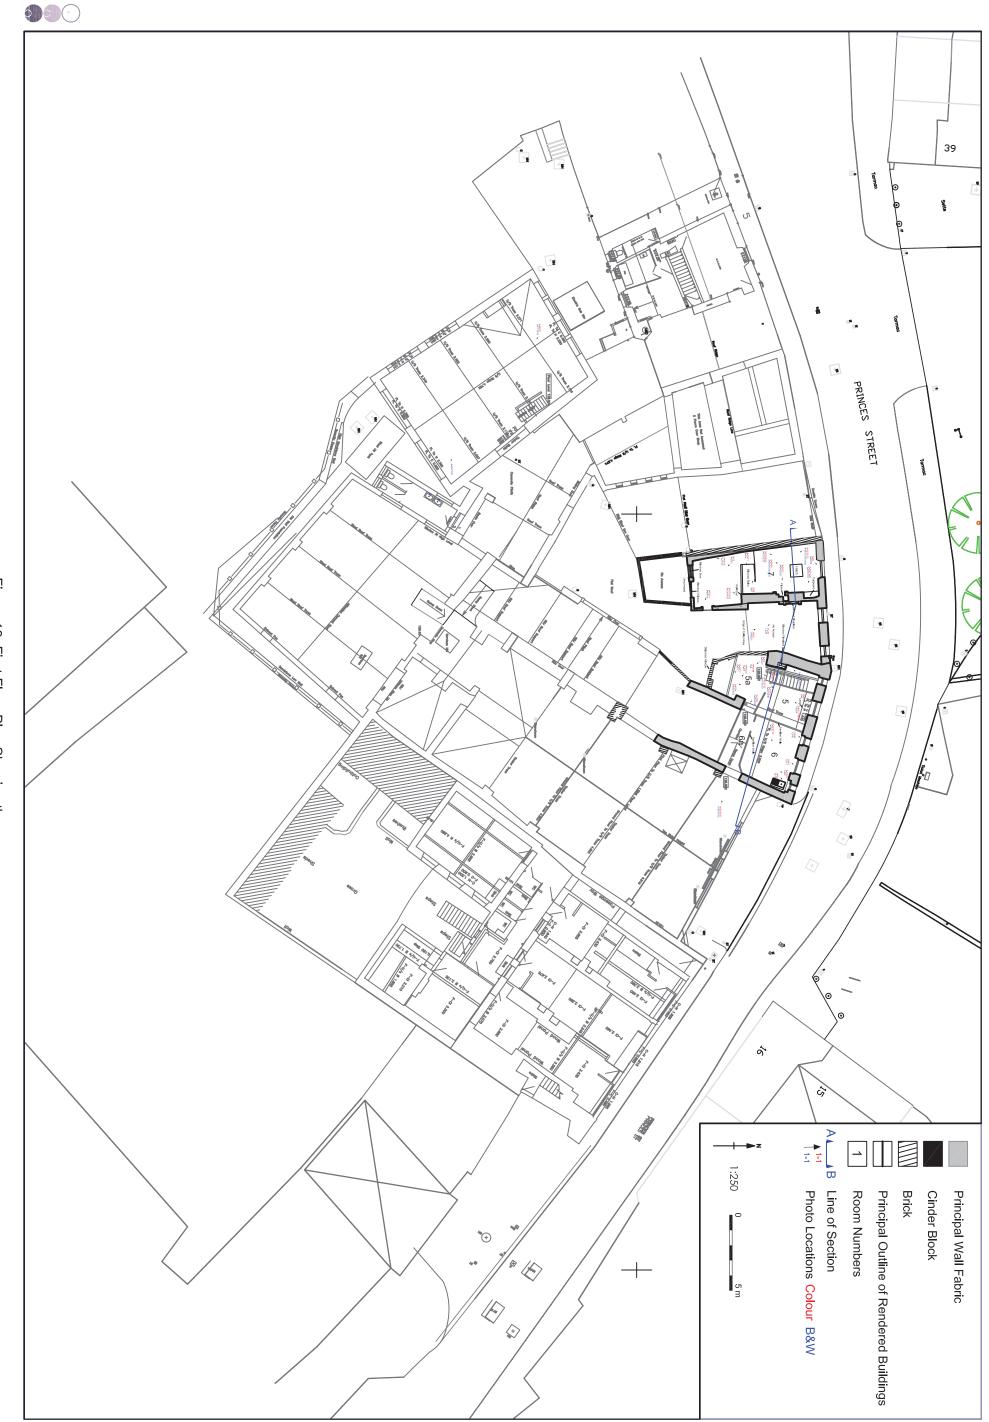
First Floor Plan Showing the Former Sunlight Laundry Complex
